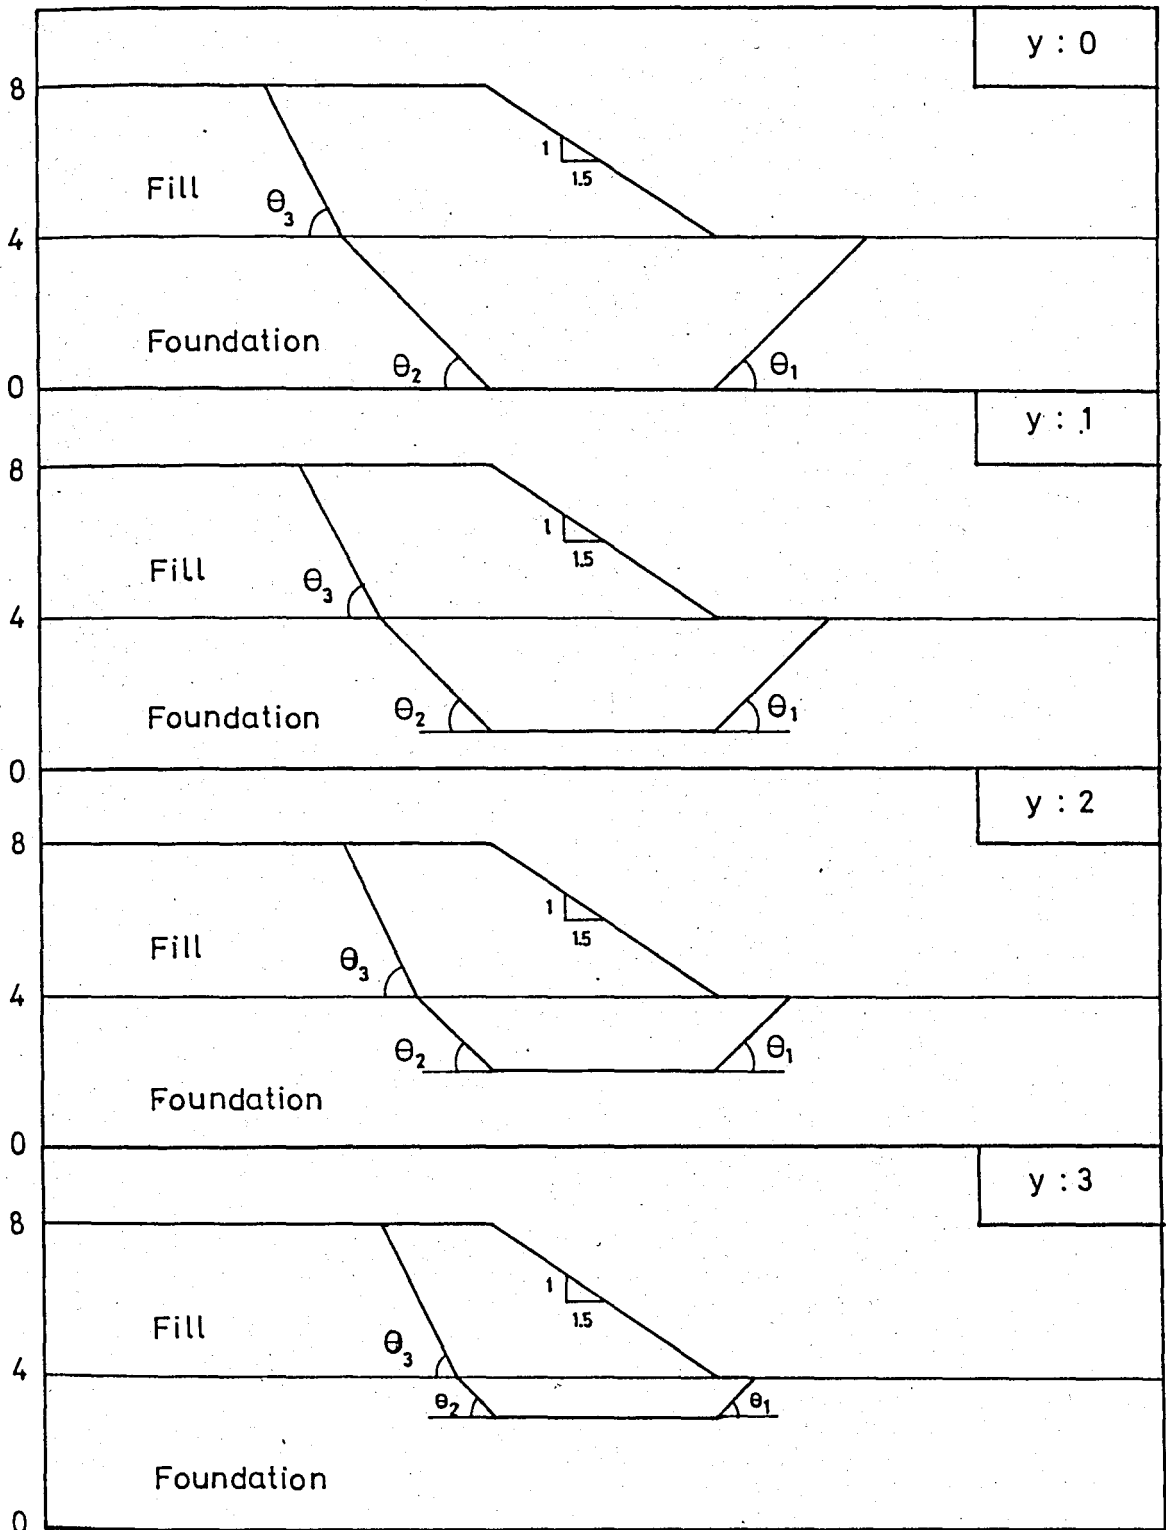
Dimensions and Profiles of the Embankment and Foundation, and the Failure Surfaces Used in the Analyses
